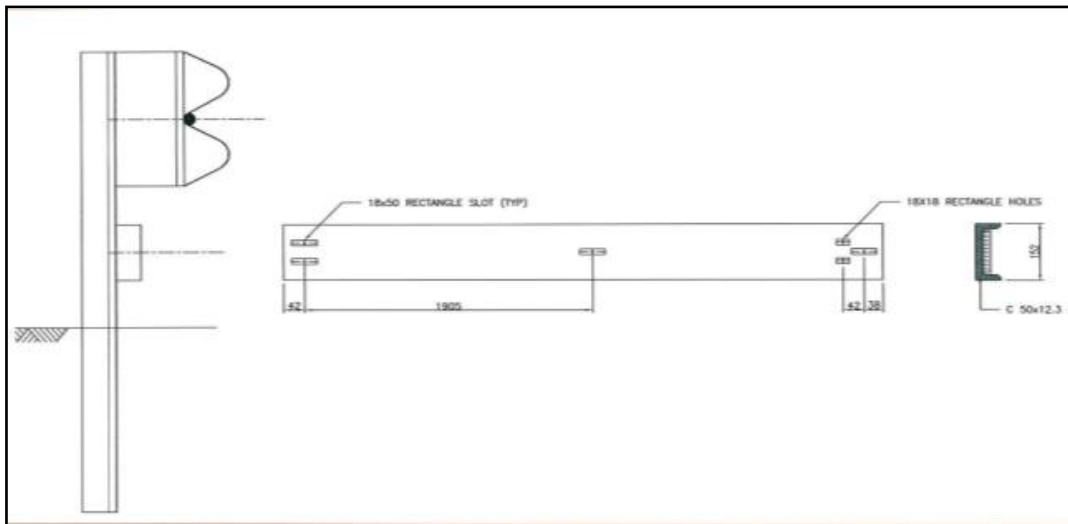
SCHEMATIC DRAWING OF RUB RAIL FITTED TO AN EXISTING W-BEAM
